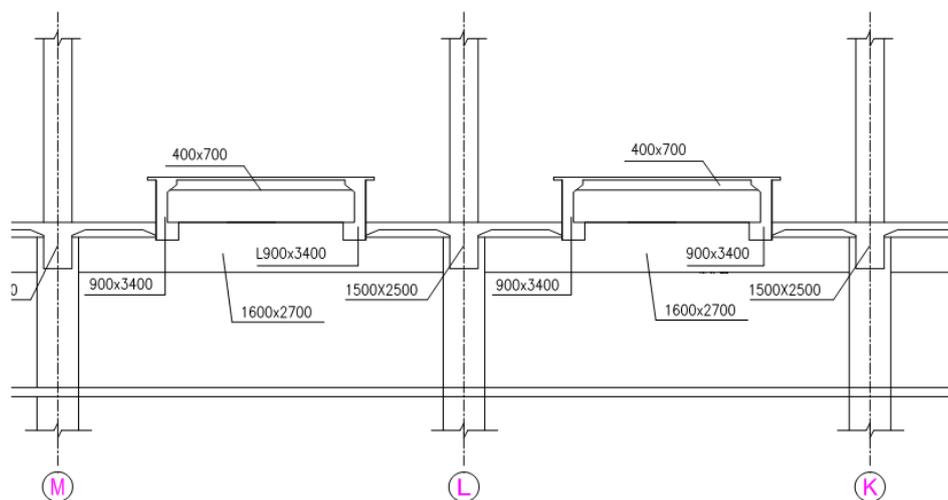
Vertical section of the rail layer for Harbinxi Railway Station layout
